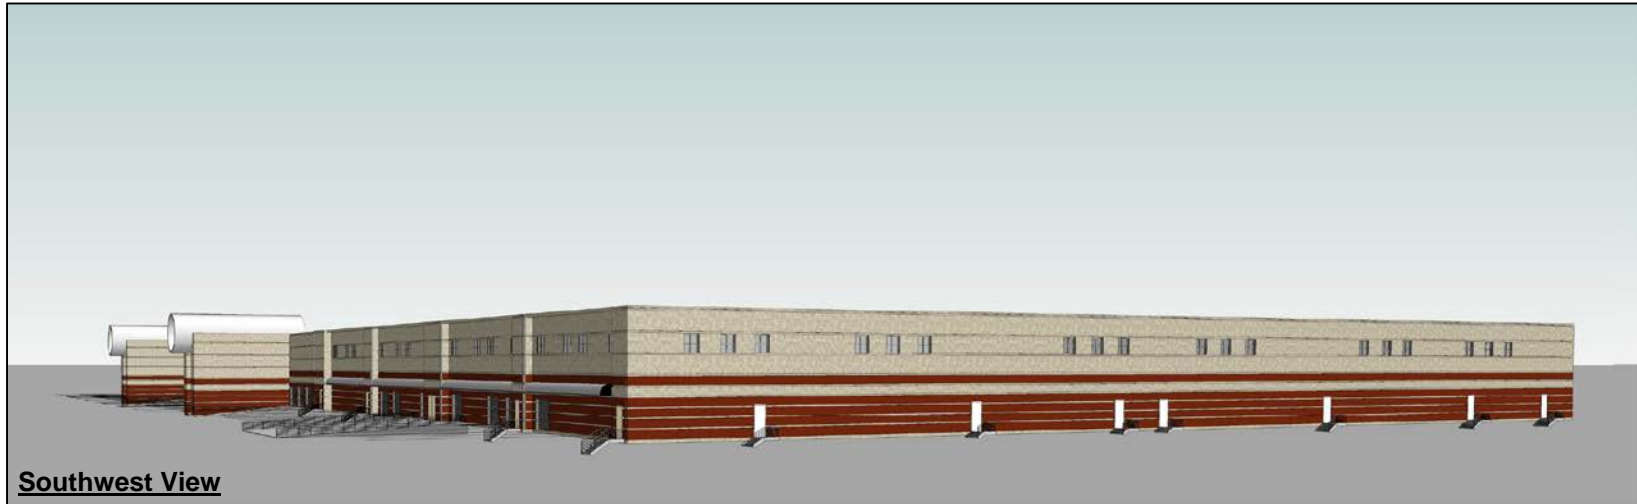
EXTERIOR ELEVATIONS—EXISTING BUILDING
